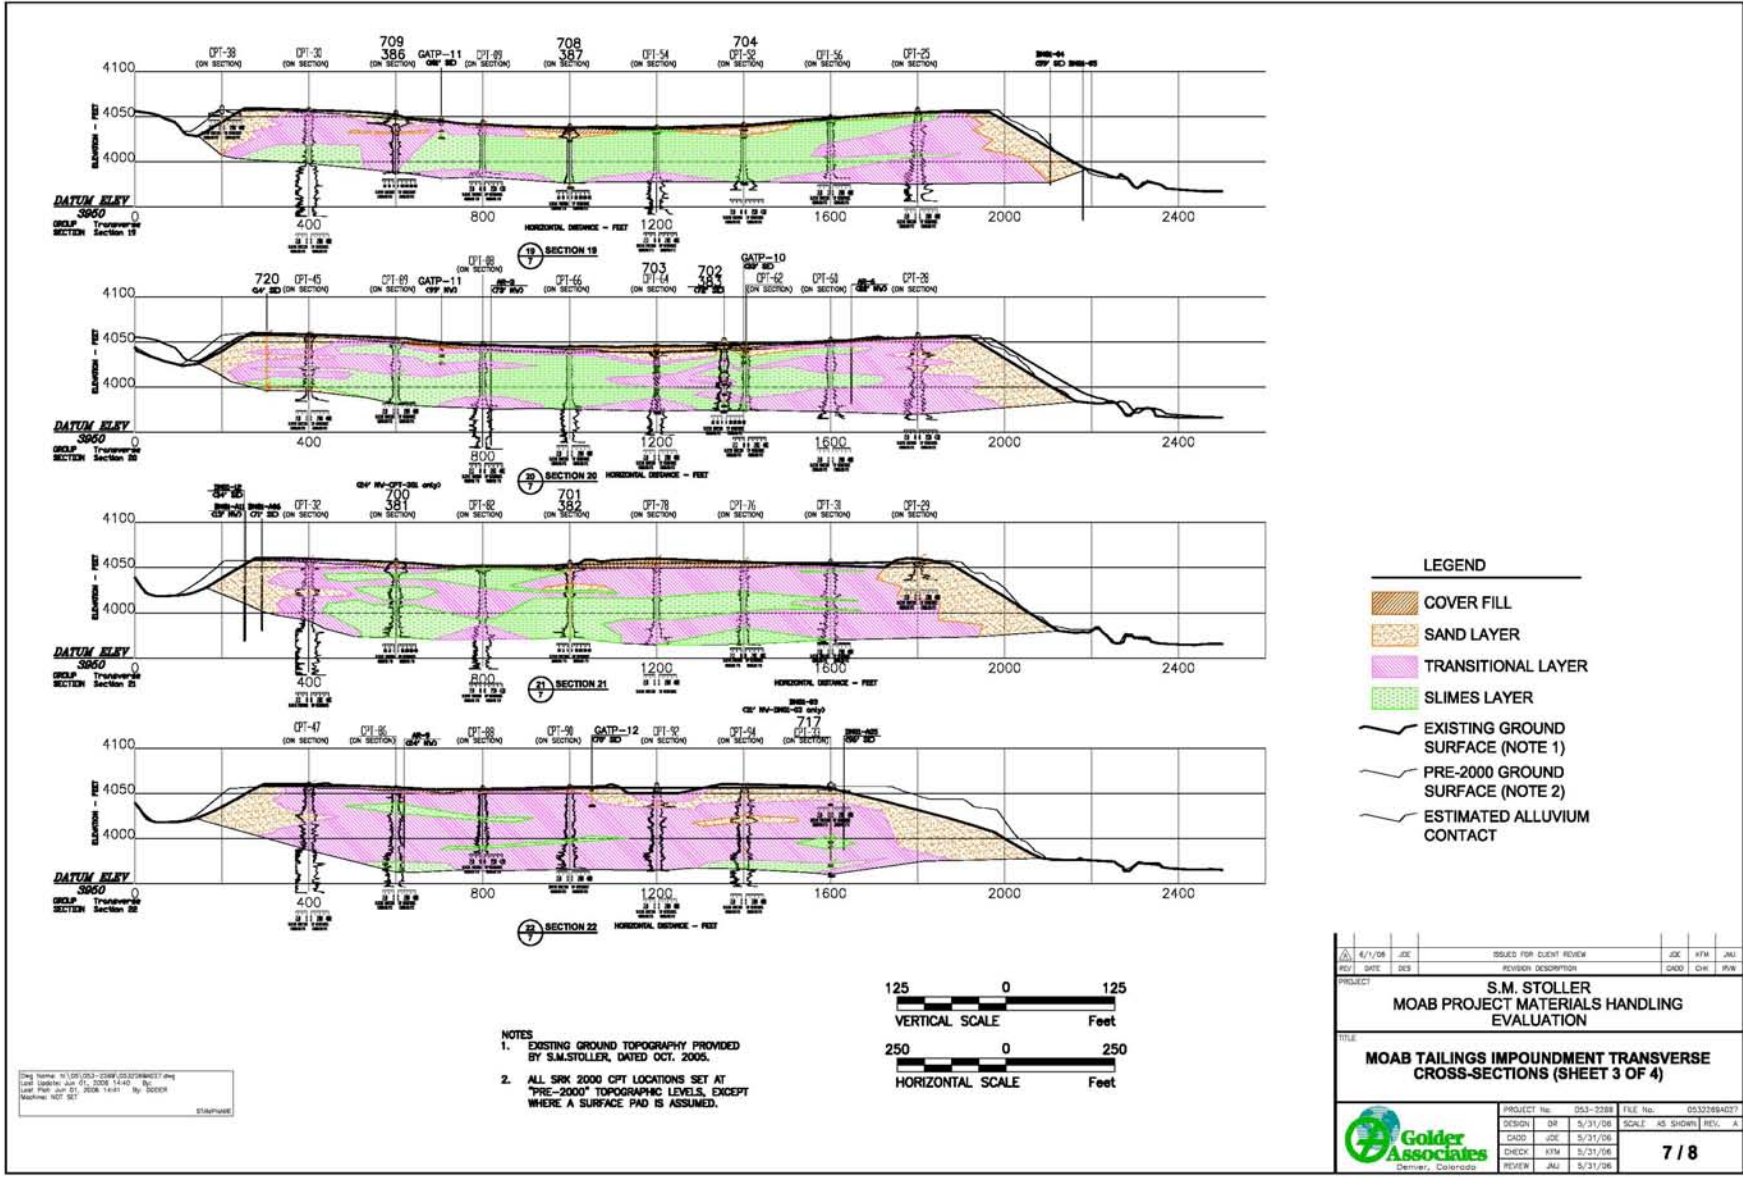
Moab Tailings Impoundment Transverse Cross Sections (Sheet 3 of 4)
